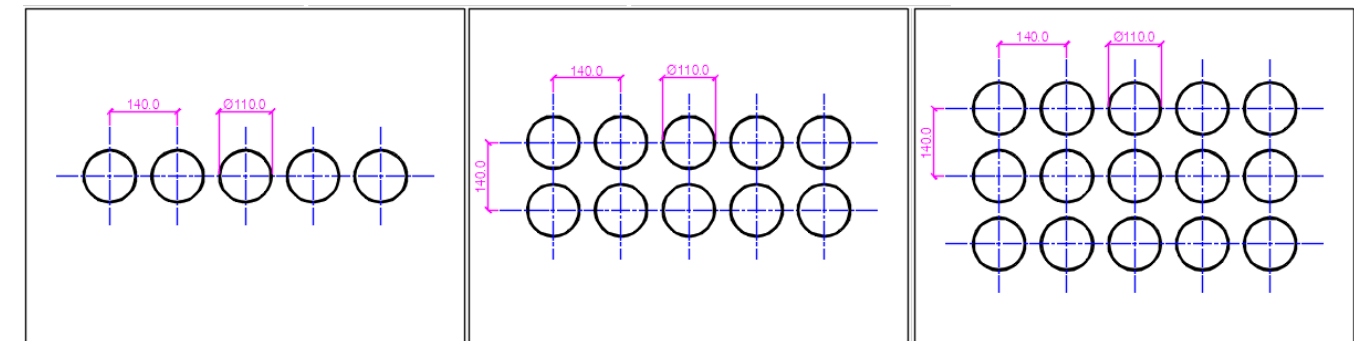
Underground cable pipe packages at the intersection with the railway UTC 1 and UTC2
